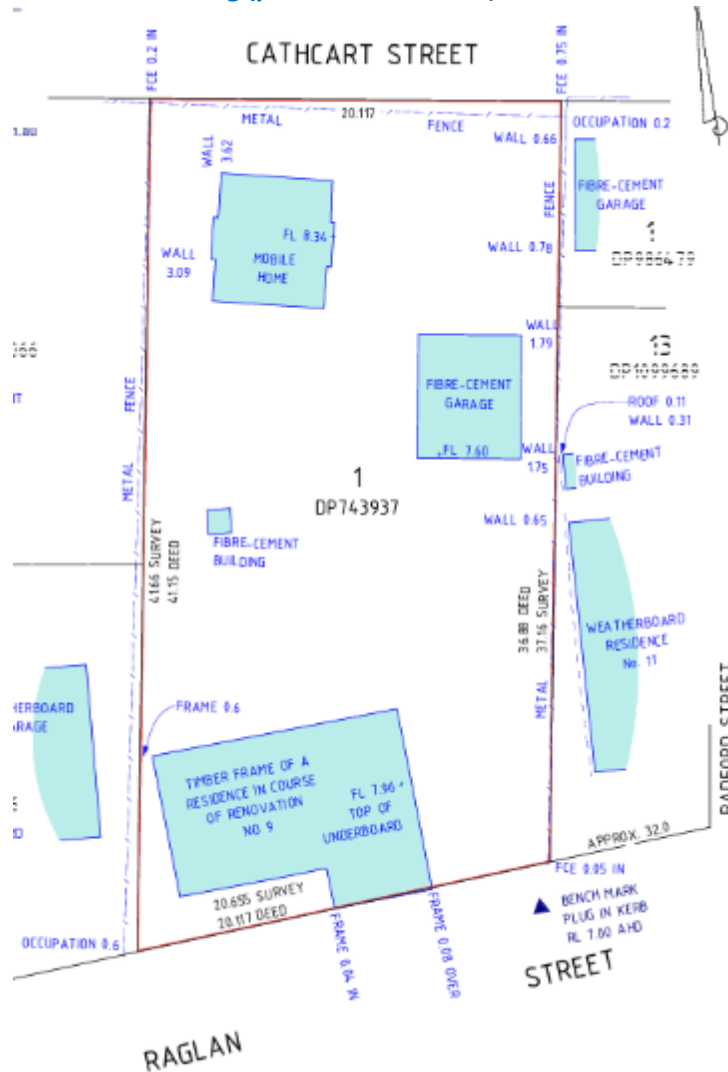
Site Plan (Source: David Cant Surveyors, April 8th 2025).
